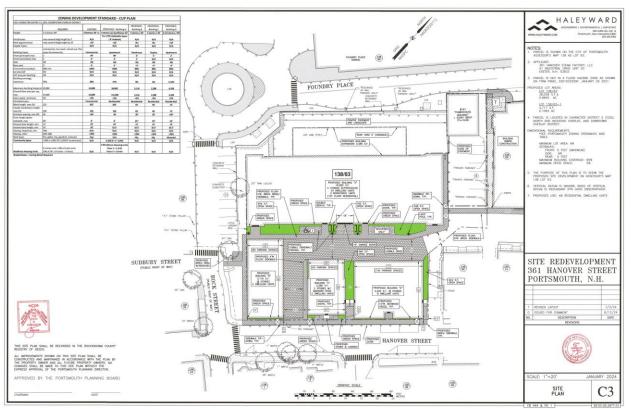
Alternative CUP Plan showing Proposed Buildings and Driveways and Open Space
